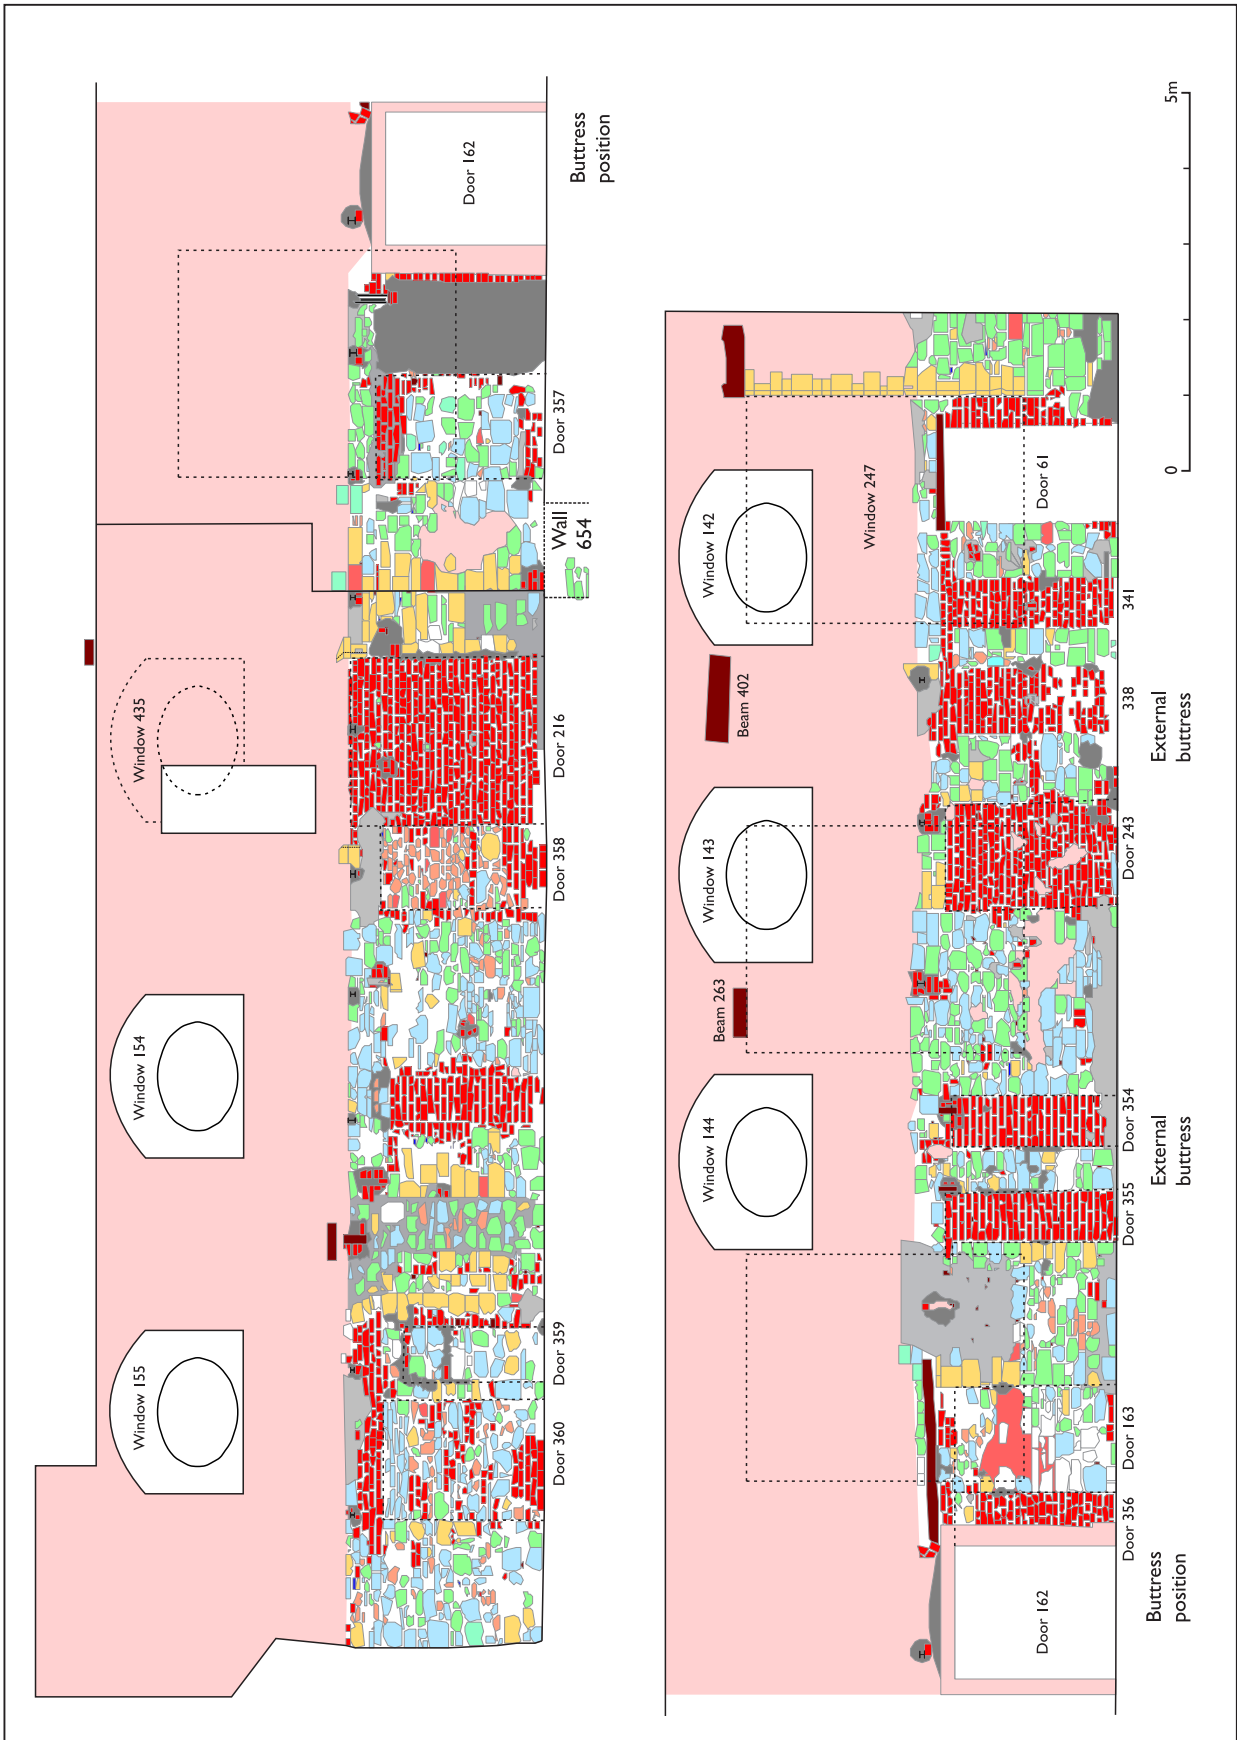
Elevation of interior south wall of the Great Hall. See Figure 3 on page 4 for key to colours.
